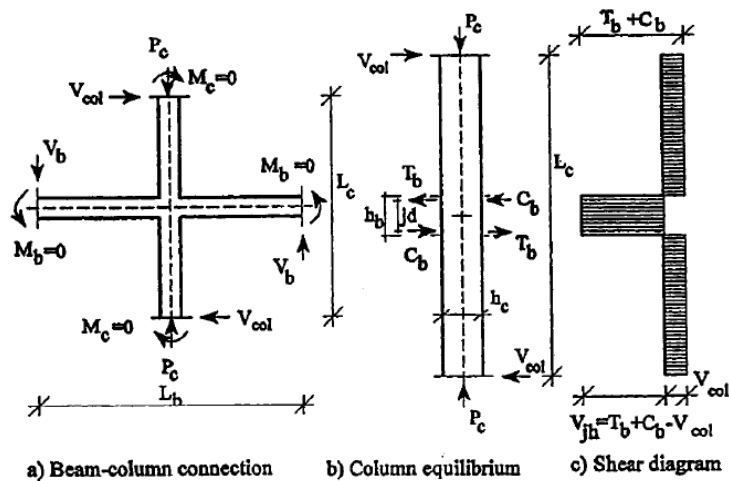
Equilibrium of an interior beam-to-column joint.
